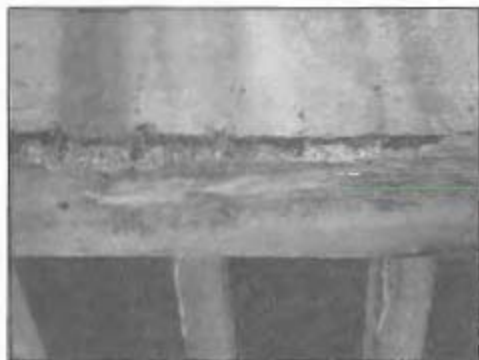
Spall, Underside of Pier 2 Cap
